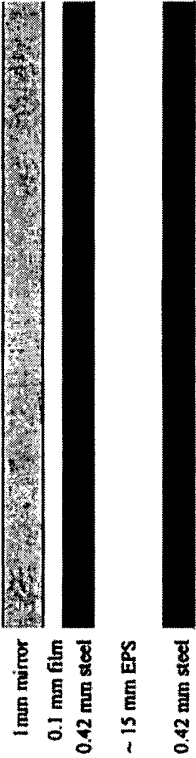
Cross section of sheet metal + EPS sandwich panel (not to scale)
